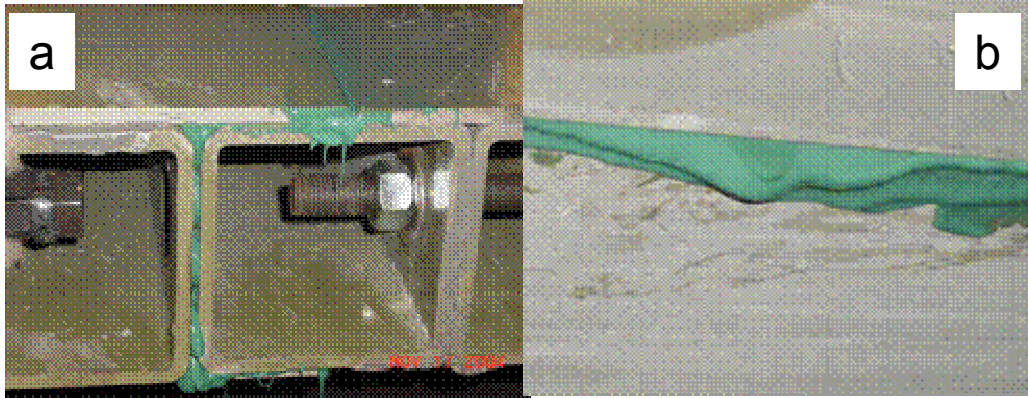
Adhesive squeezing out from joints (a) Side view (b) Bottom view
